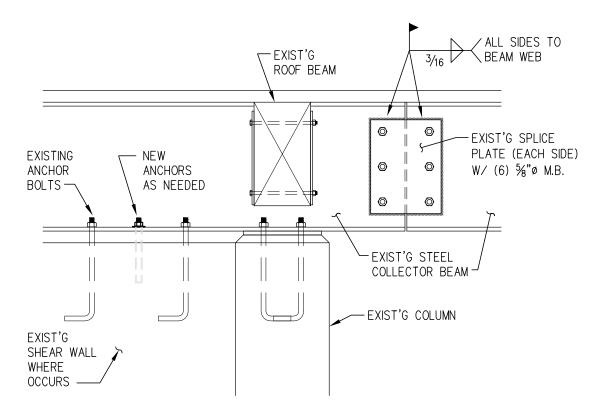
F: ELEVATION: EXISTING STEEL BEAM AT COLUMN AND SHEAR WALL
